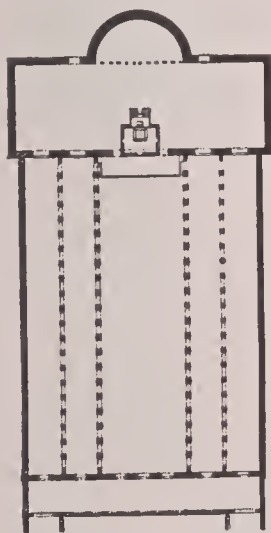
Plan, Basilica St. Paul beyond the Walls.
